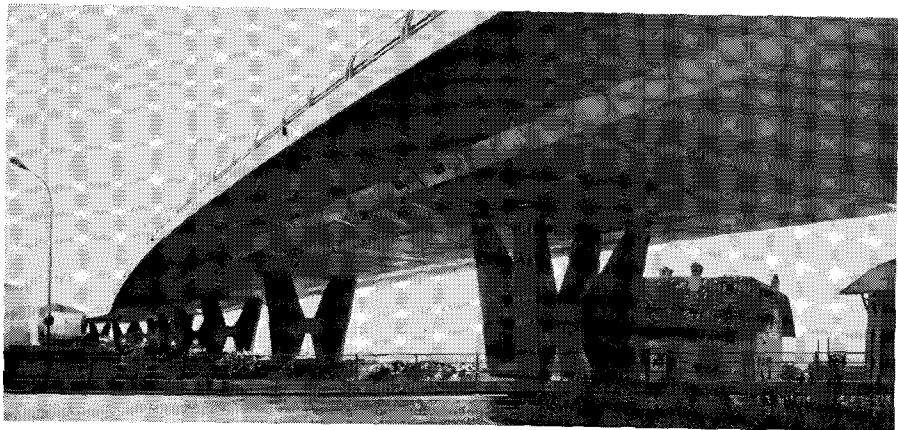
Pier is made up of four columns in prestressed reinforced concrete.
